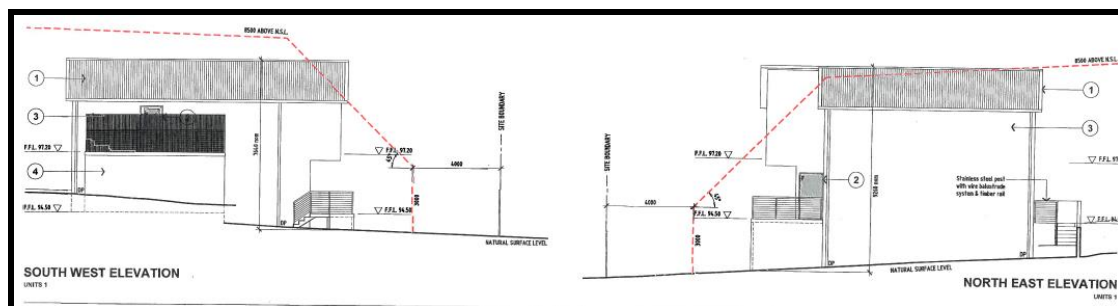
An excerpt from the submitted plans showing the extent of the building protruding outside the building envelope.
